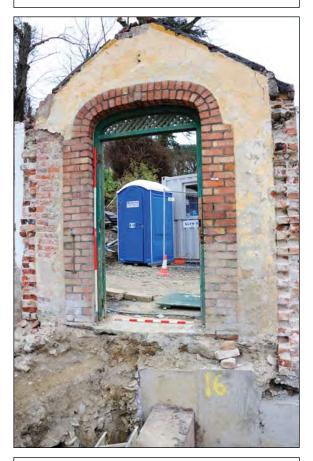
Outbuilding Entrance to Walled Garden - Rear Elevation
